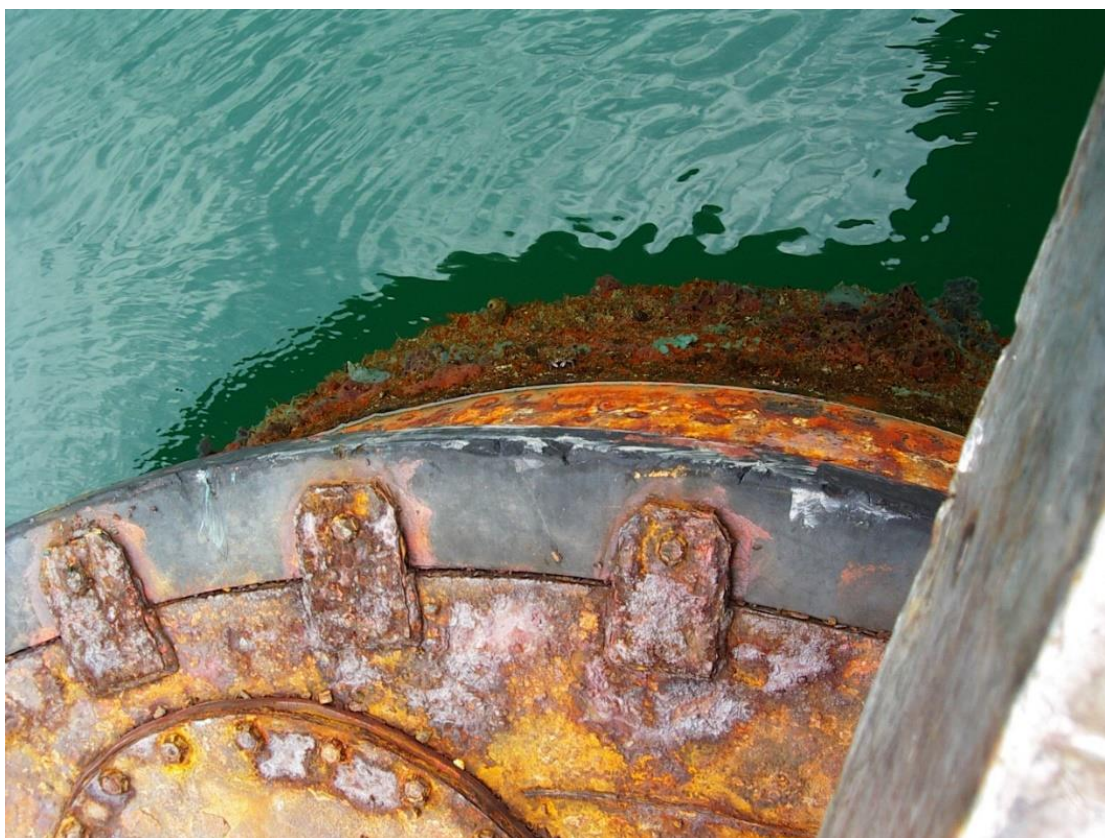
Rusted metal at Halong Bay, Vietnam, photo by author, 2002
